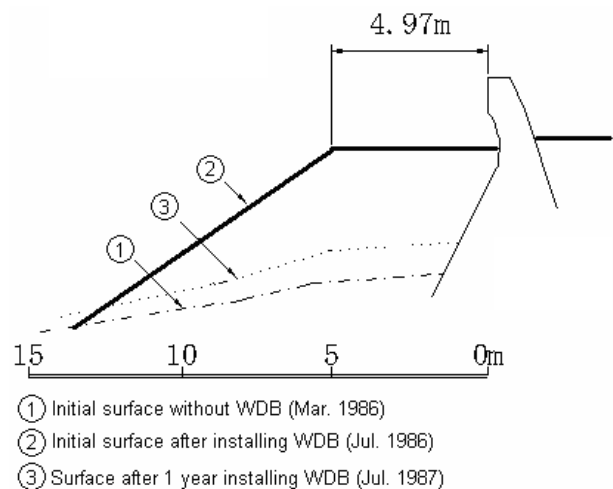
Observed settlement of wave-dissipating blocks at an actual site
